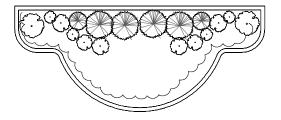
Perimeter Gateway and Floral Feature Entry Point Plan
